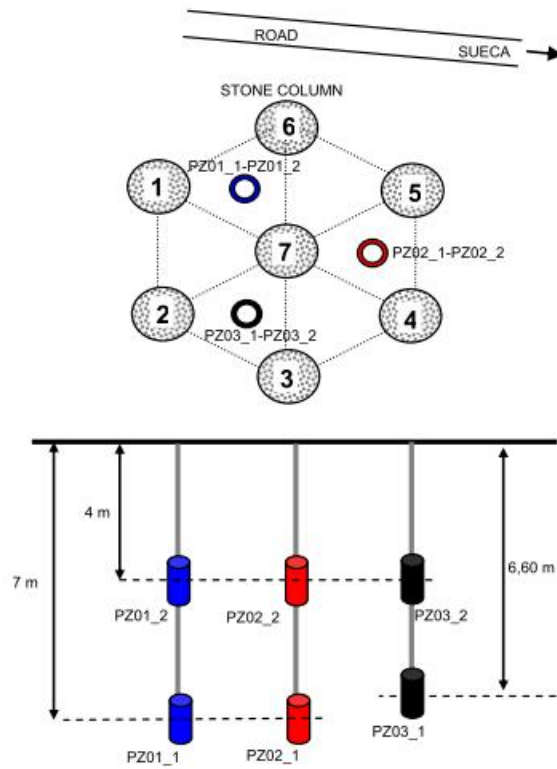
Stone column and instrumentation layout for reported heave by Castro (2007)
